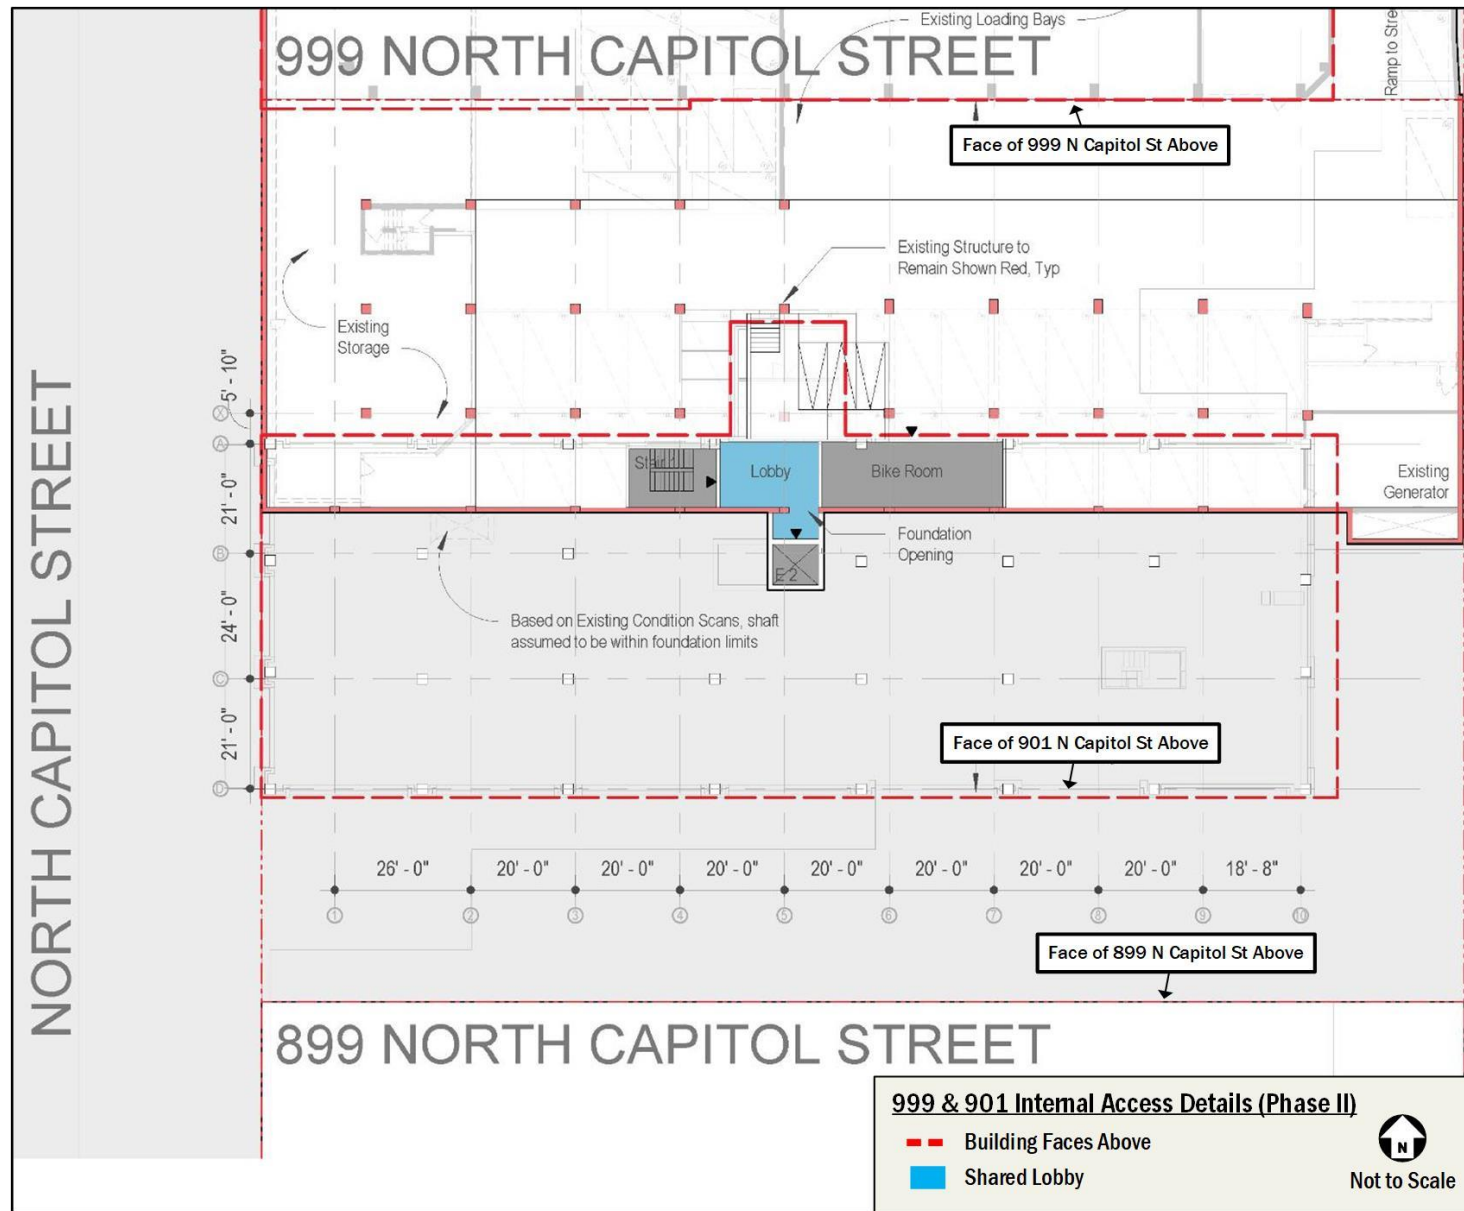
999 and 901 North Capitol Street Internal Access Details
